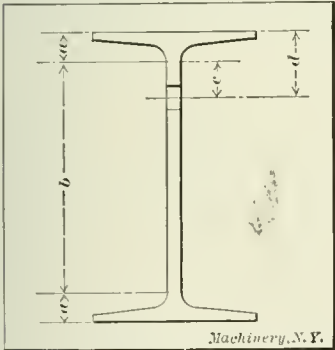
Method of Spacing Rivet Holes to prevent Plates from encroaching on the Fillets and Slopes of Sections
